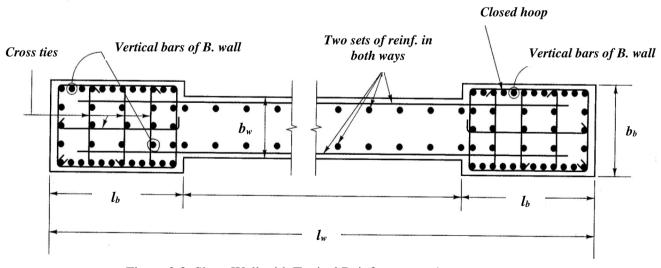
Shear Wall with Typical Reinforcement Arrangement
